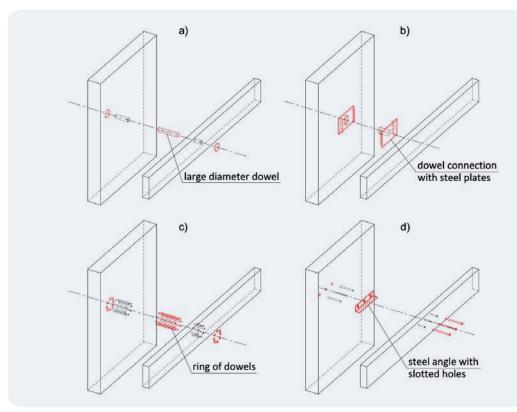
Suggested diaphragm-to-wall connection details: a) large diameter dowel connection (timber-timber); b) dowel connection (steel-steel); c) multiple dowel connection (timber-timber); and (d) steel angle with slotted holes.
